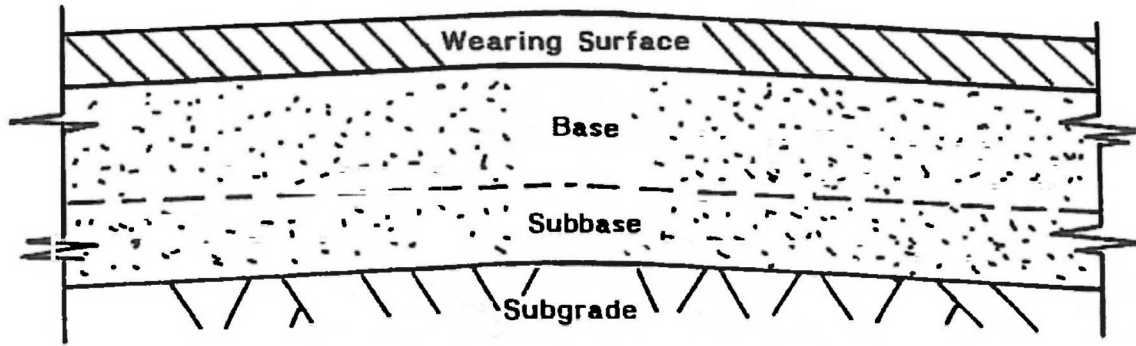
Simplified flexible pavement structure (Seelye, 1945).
